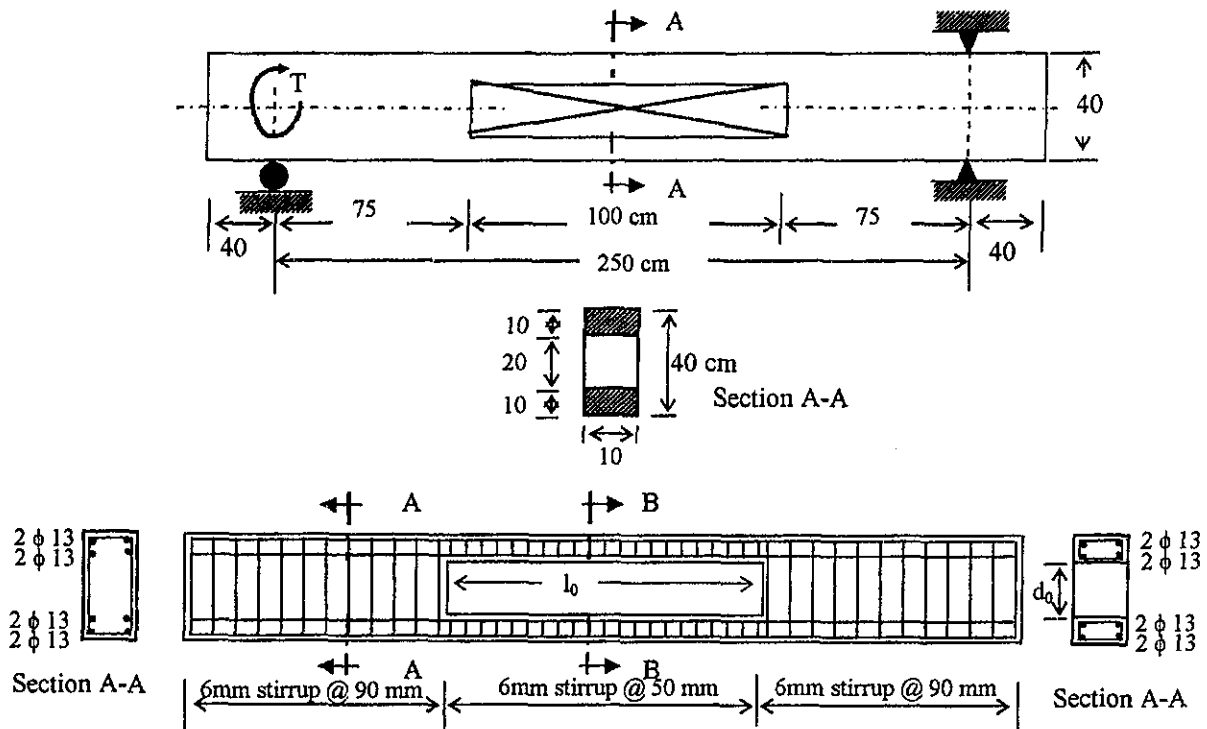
Dimensions and reinforcement details of the tested beam [4]
